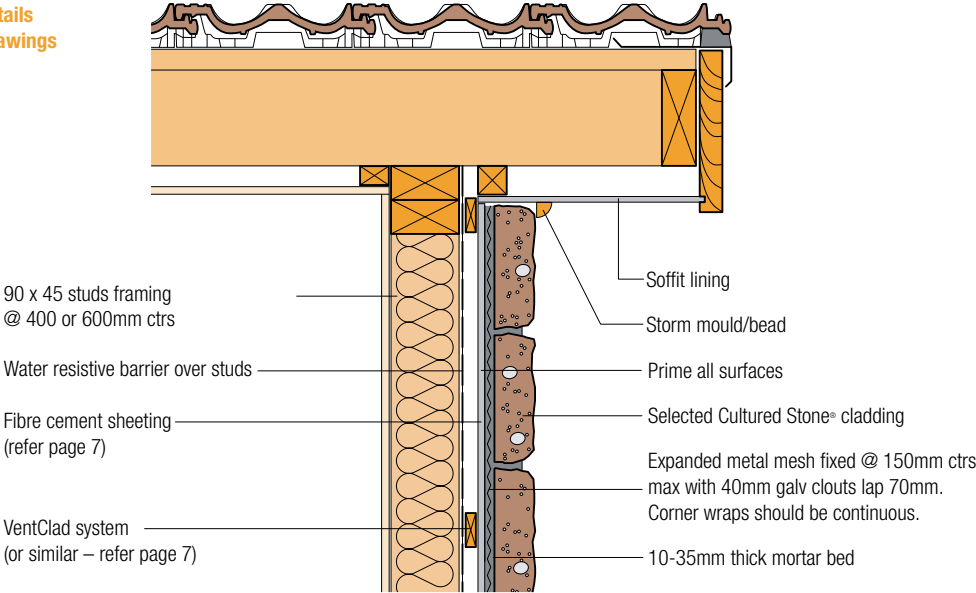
Typical Raking Eave - Section (Dwg # CS-09.02)
